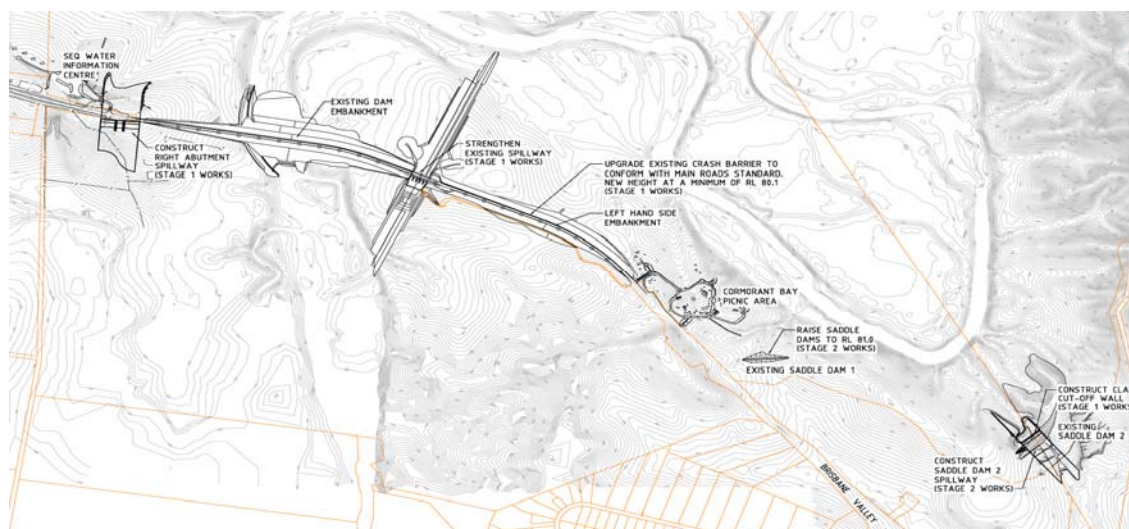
Location and General Arrangement of the Wivenhoe Dam Auxiliary Spillways
